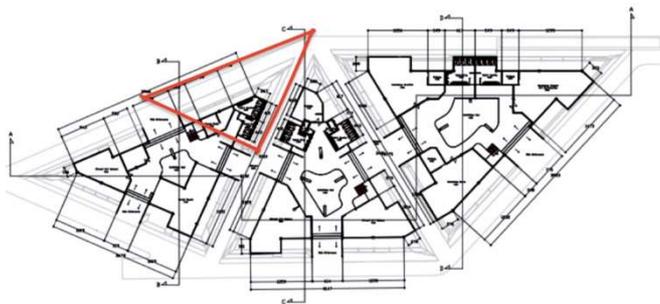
RFPProject with the triangular corners of the building floor plan was cut to fit the standard rectangular shape of the public toilets floor plan. Source: Department of Architecture, Hasanuddin University [38].
